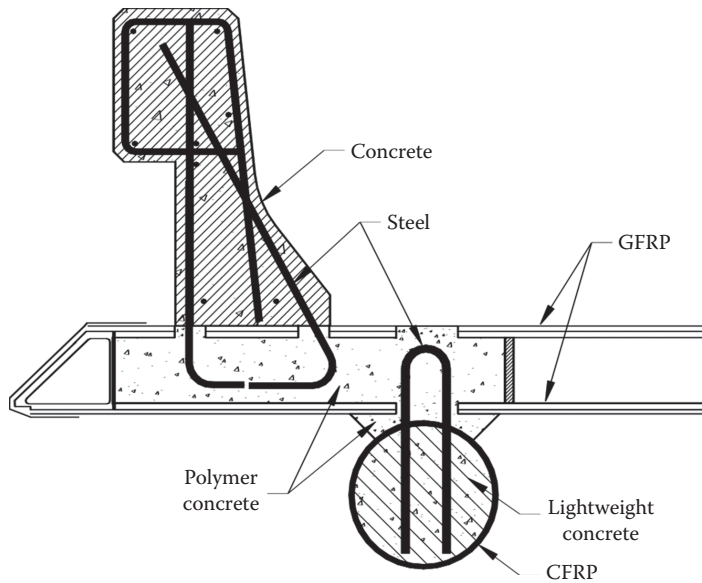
Guardrail connection to FRP deck/girder.
